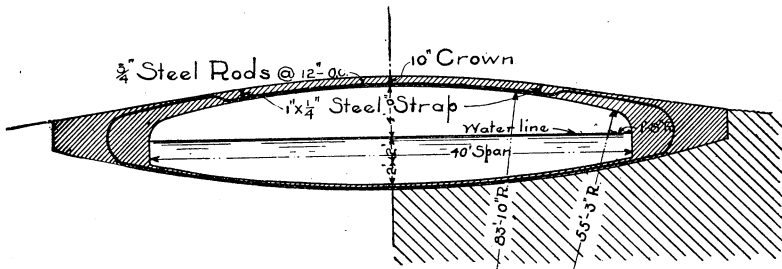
Section of a Bridge With Forty-Foot Span, Lafayette, Ind.
